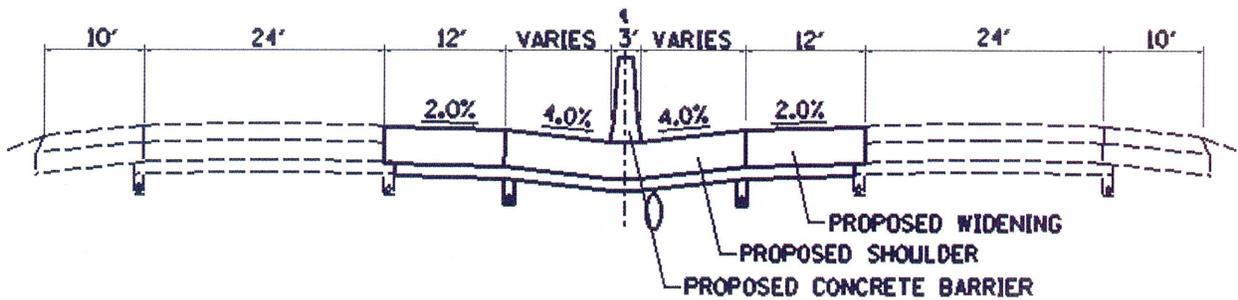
PROPOSED INSIDE WIDENING LAYOUT
